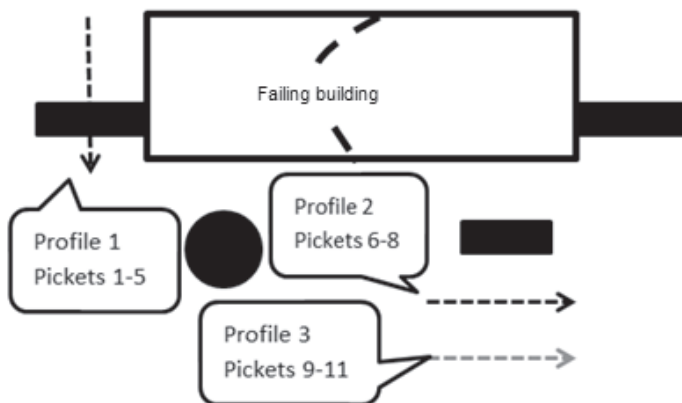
Plan of the failing building, buttresses, and observation profiles.
